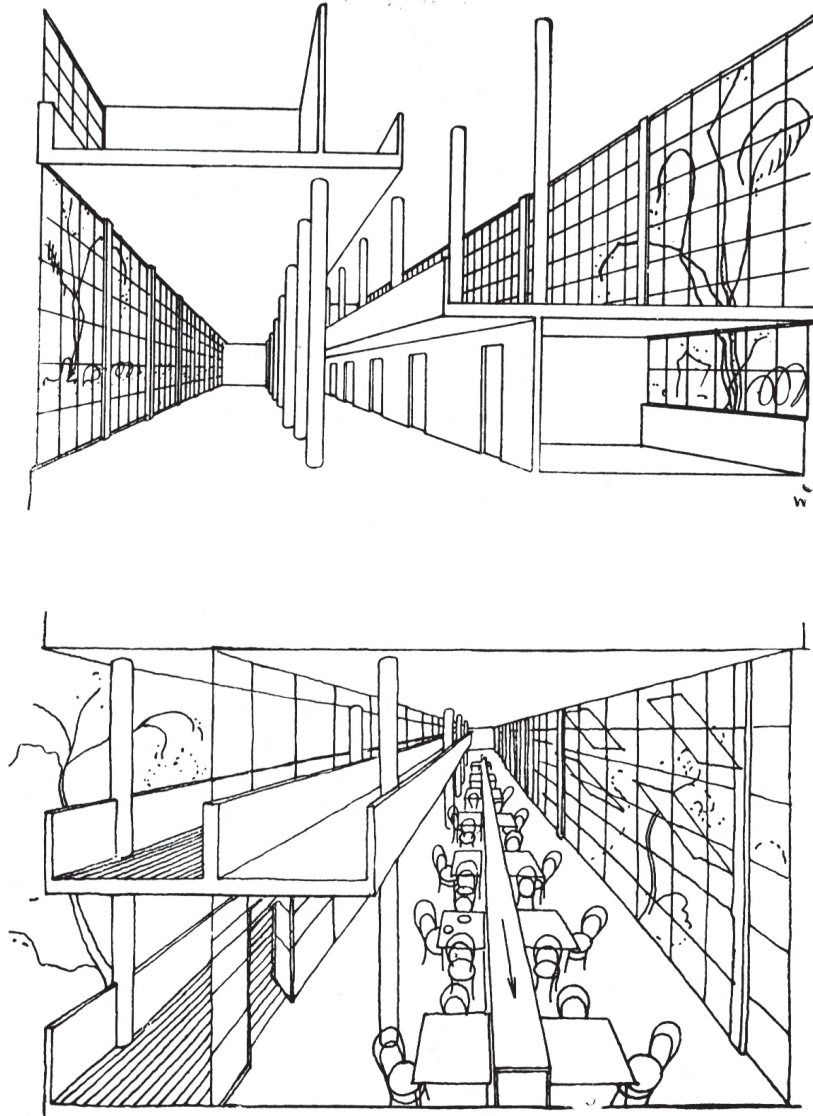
Rest and recreation hall and dining hall at Narkomfin; from Teige, *The Minimum Dwelling*.
